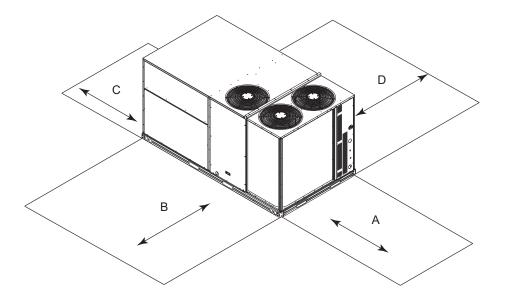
Unit Dimensional Drawing – 14 Size Unit (cont.)
